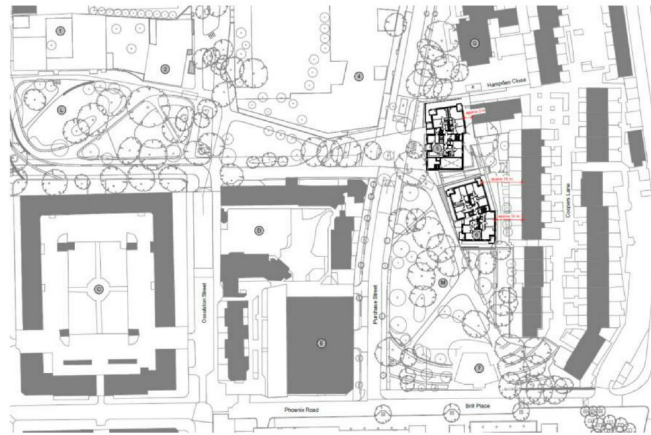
Extract from Proposed Site Plan showing Plots 5 and 6, prepared by Levitt Bernstein (submitted under ref. 2022/2855/P)
